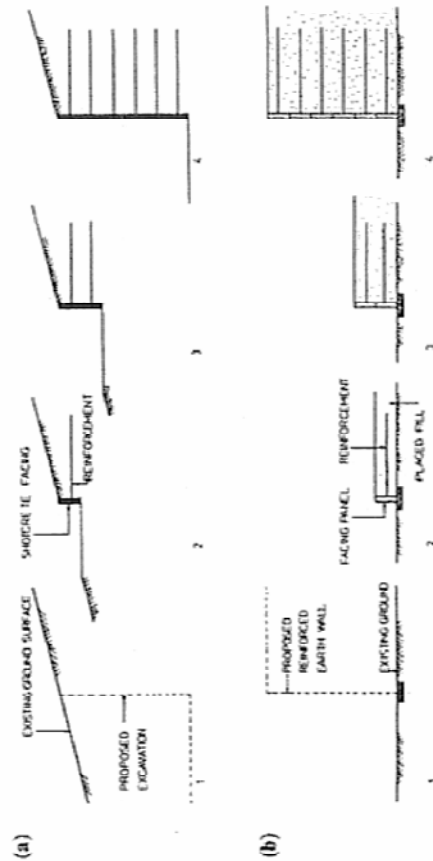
Contrast of the construction sequence: (a) 'top down' in soil nailing; and (b) 'bottom up' for reinforced soil.<sup>1</sup>
